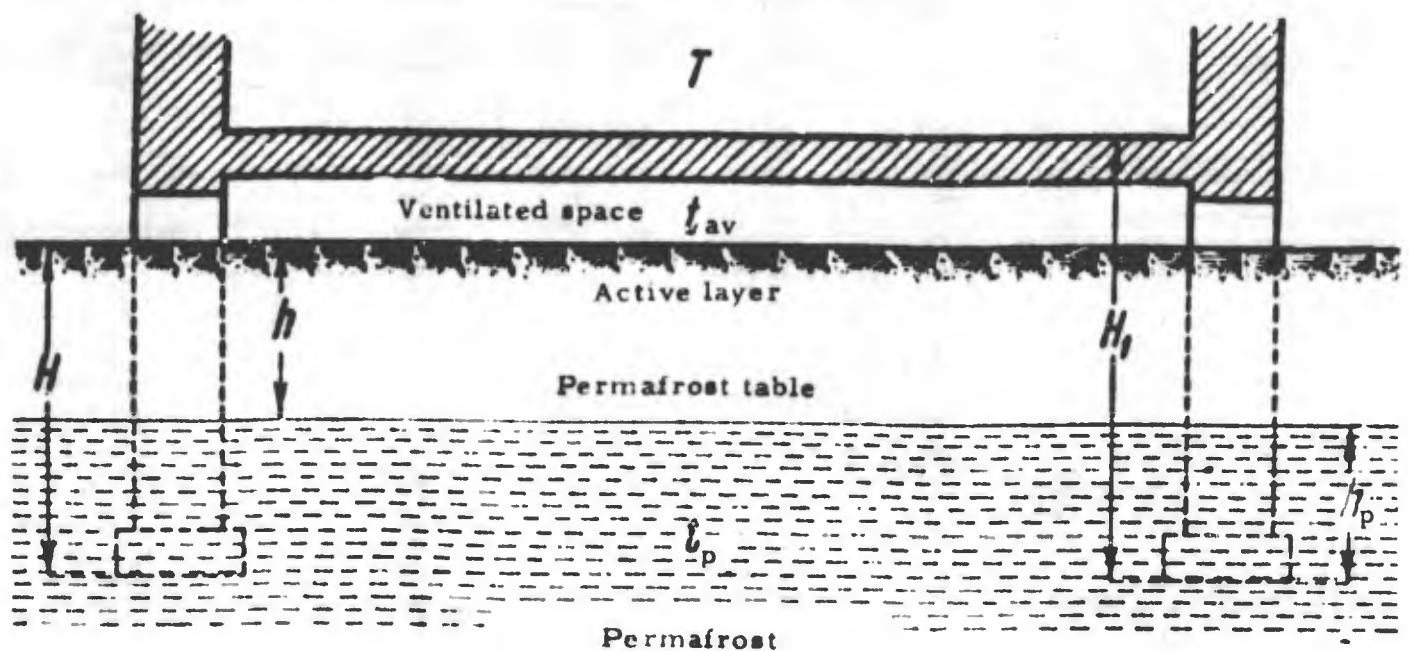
Plan of foundations planned according to the system of individual piles with a ventilated space under the floor.
